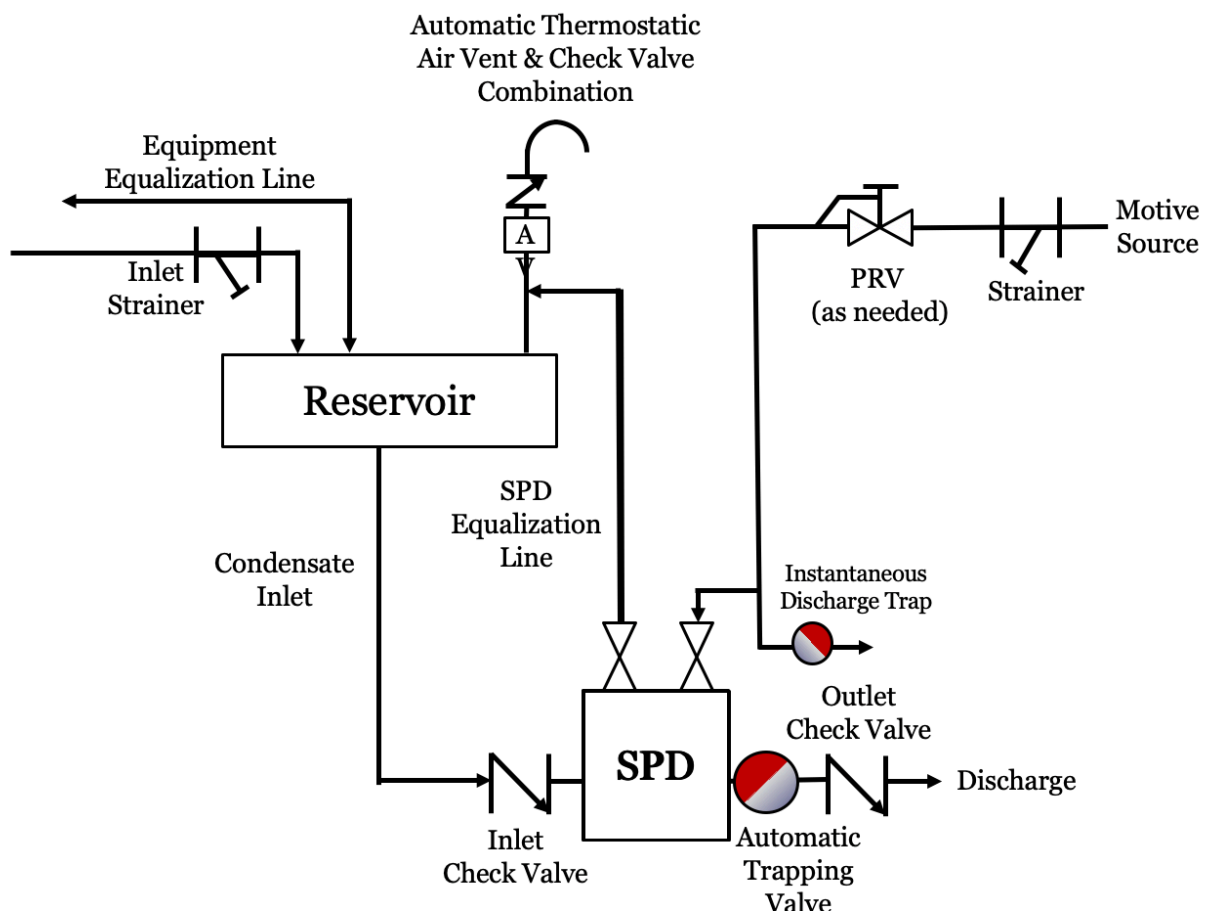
SPD – Pumping Condensate and Preventing Steam Loss from Steam-using Equipment with Varying Internal Pressure
